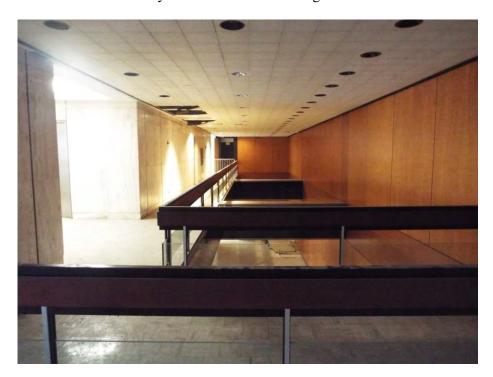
3^{rd} floor main lobby looking down at level 2 – camera facing east
